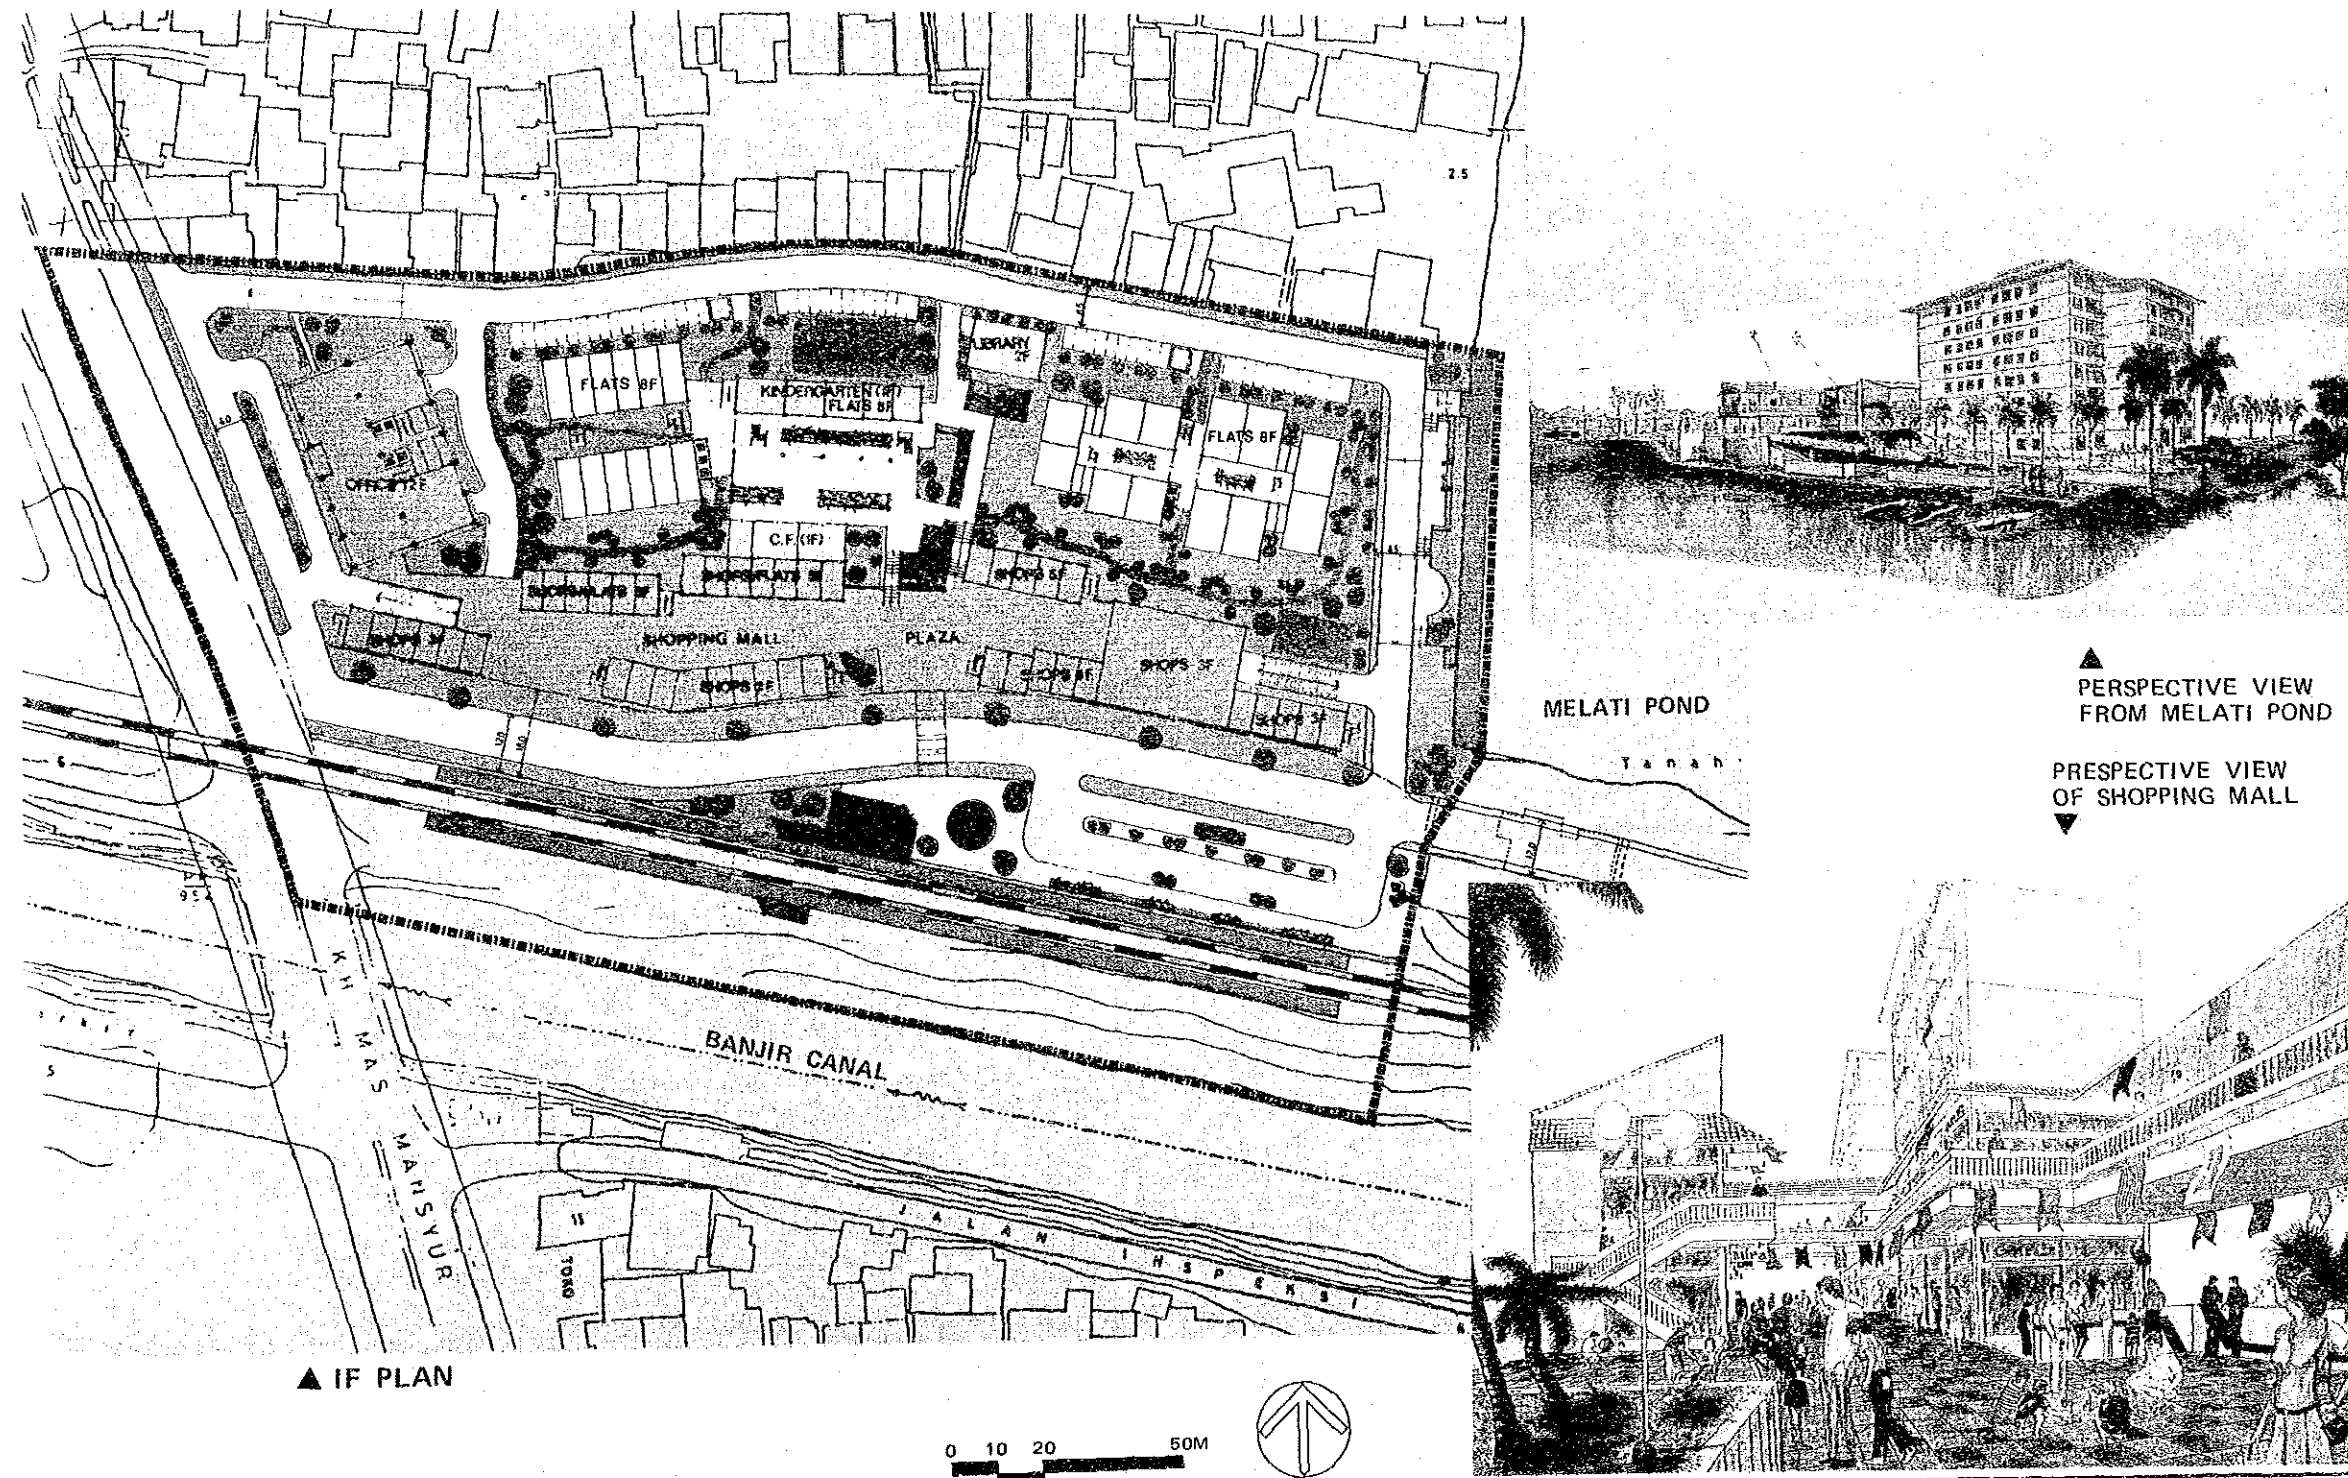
LAYOUT PLANNING - KEBON MELATI
